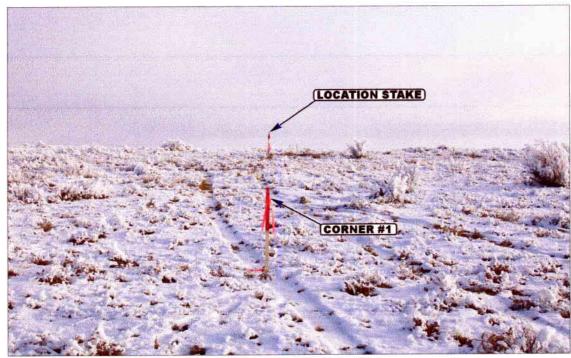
PHOTO: VIEW FROM CORNER #1 TO LOCATION STAKE
